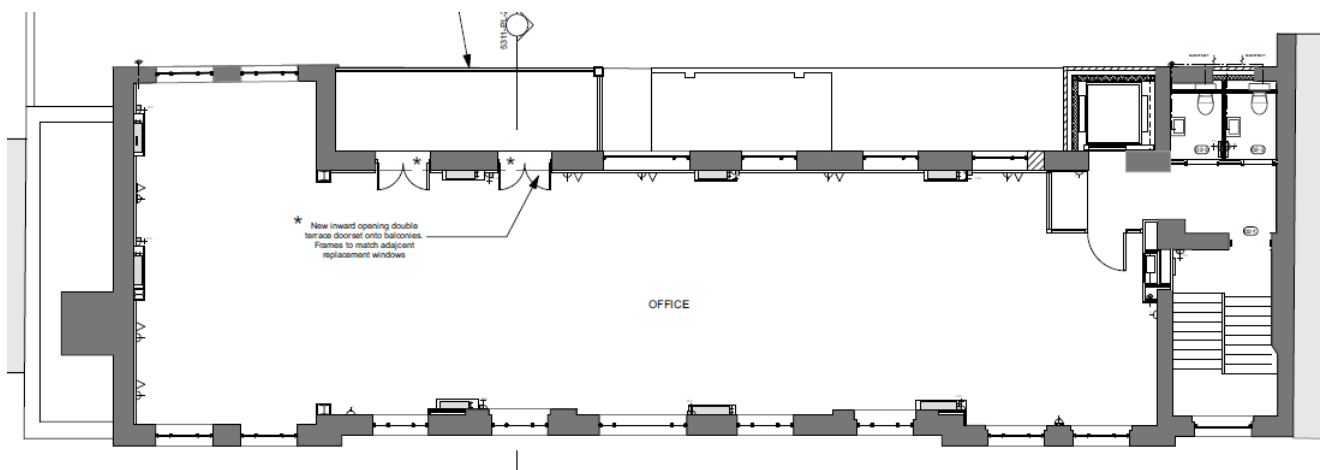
Proposed second floor plan showing proposed balcony. Balcony to be level with rear wing.
